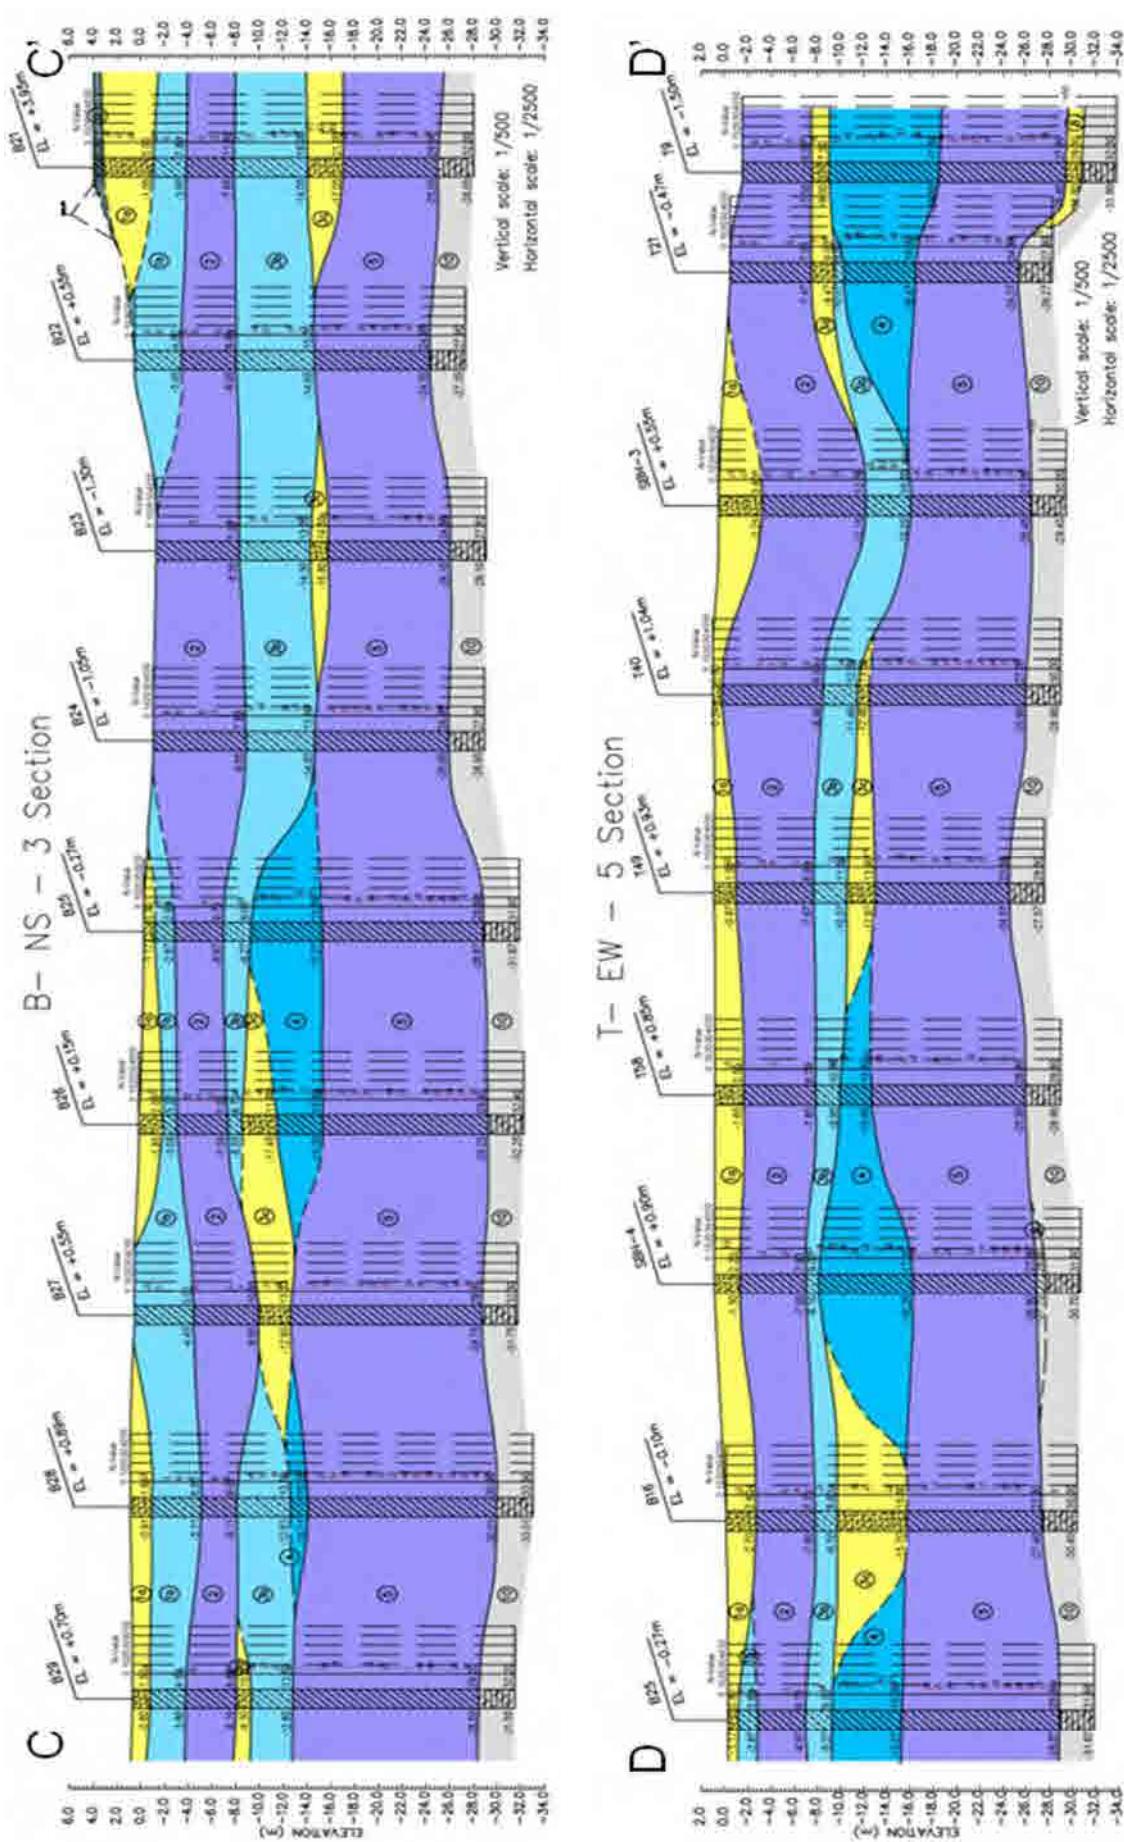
Soil Profiles at Terminal Area and Access Road Area (C-C' and D-D' sections)
